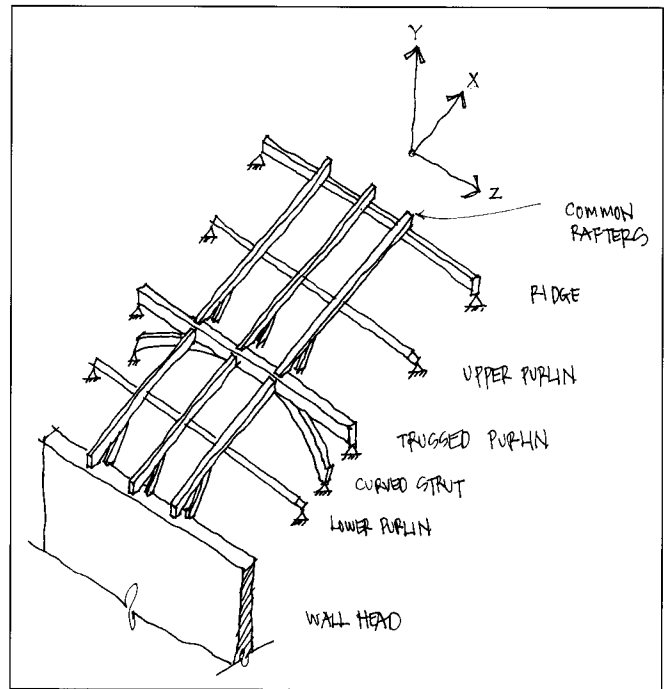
Westminster Hall roof, framing schematic. A three-dimensional finite element model was built based on this schematic to determine the truss load pattern (see Fig. 9). Note the five points of connection where roof members apply point loads to the truss. FIGURE 9: Westminster Hall, roof, support and loading diagram for trusses per Baines's Schedule no. 27 and authors' 3-D finite element model of the roof structure.
